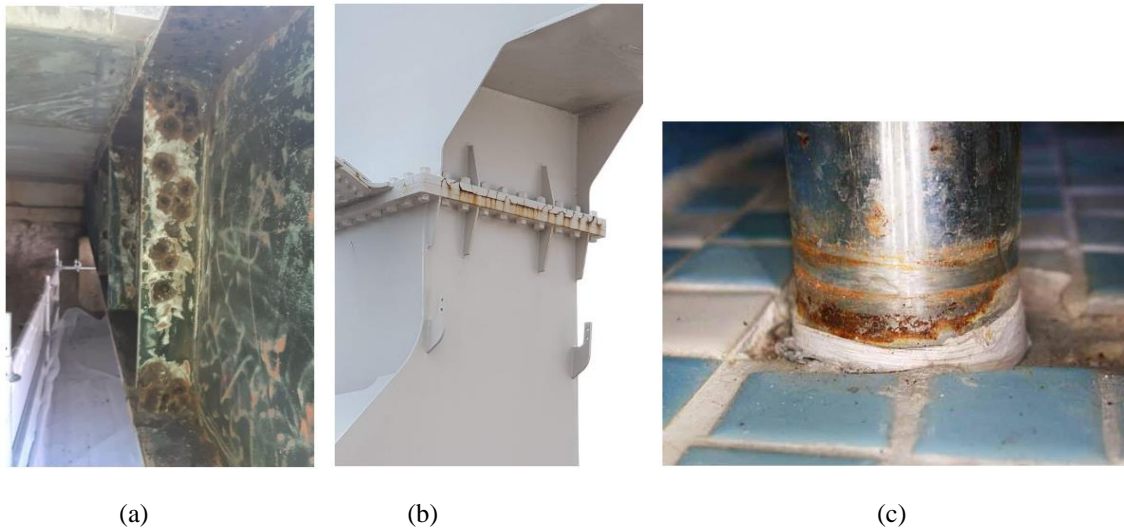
(a) Pitting Corrosion (b) Crevice Corrosion (c) HASCC- The Invisible Corrosion
